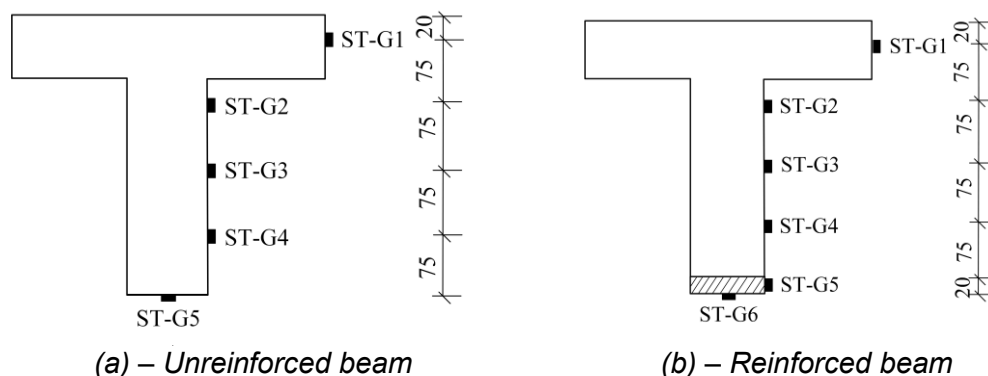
Concrete strain measurement point arrangement (unit: mm)
